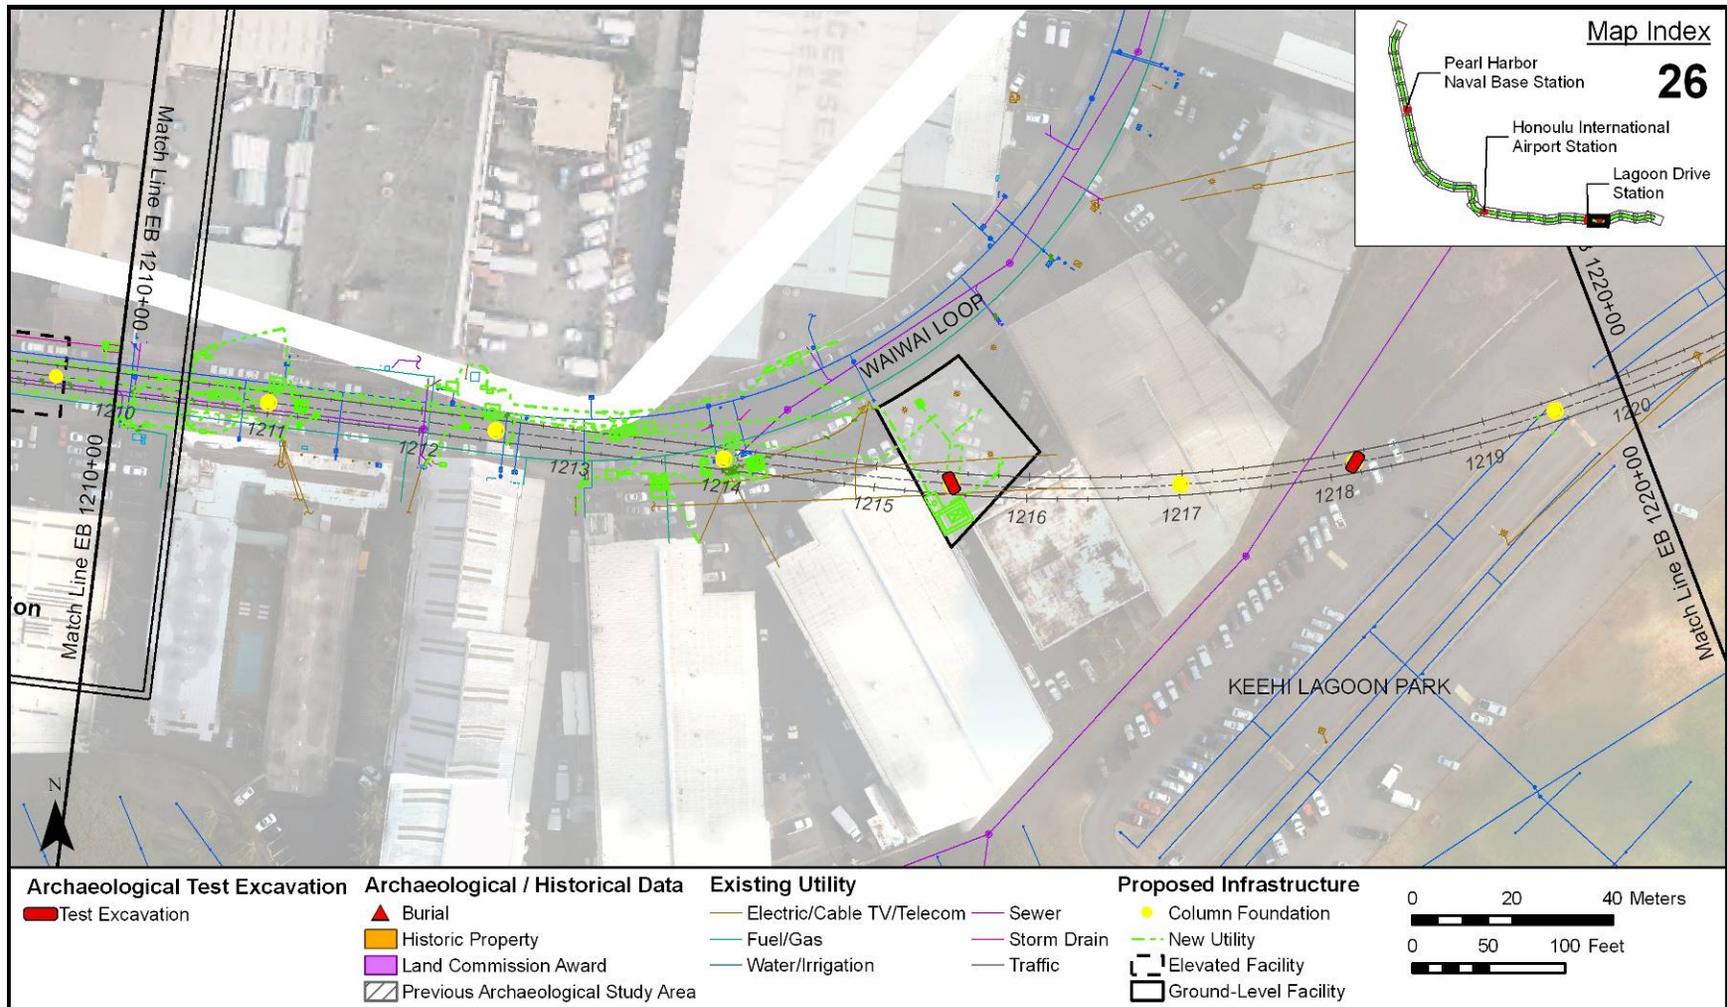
Map Sheet J 26, two 10x3 excavations at column foundations @ 1215+50 & 1218+20
